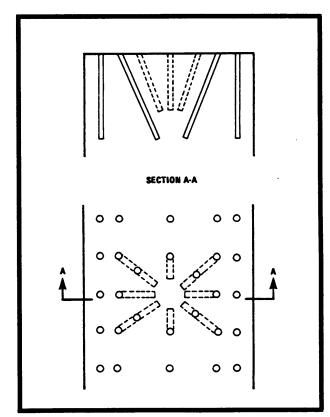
Pyramid Cut to Open a Subsurface Rock Excavation
